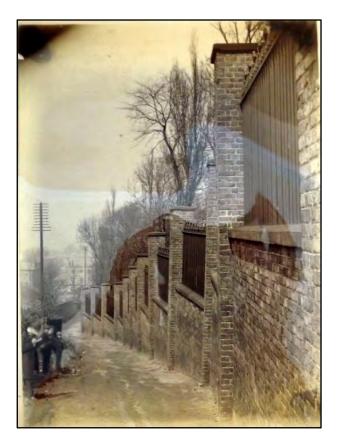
Boundary wall on Cemetery Road, circa 1899, showing tilting brick pillars
